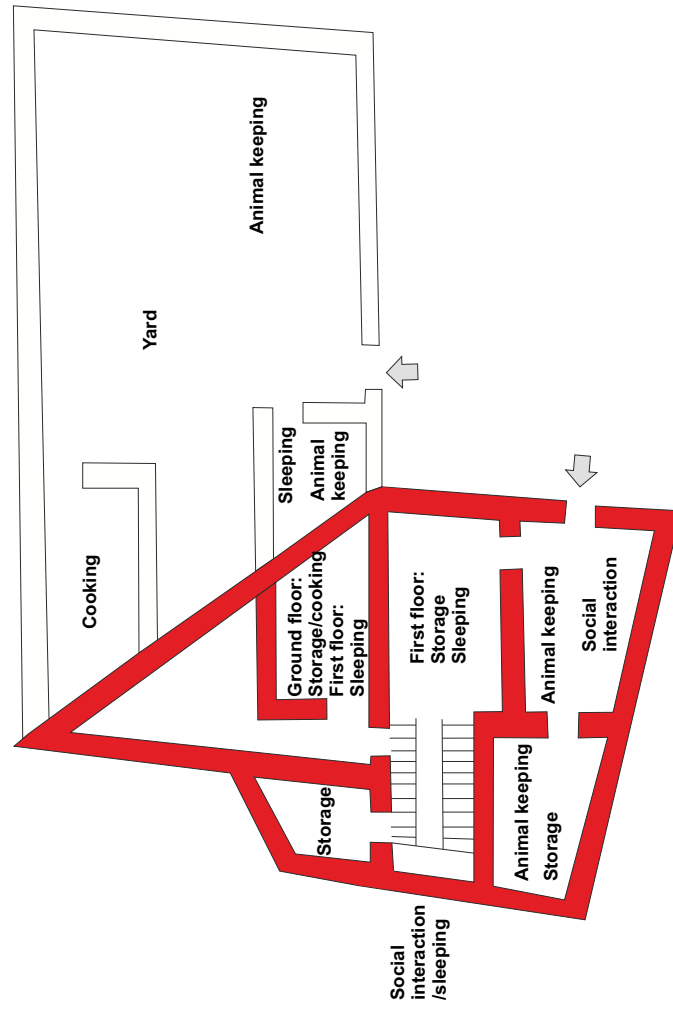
House of Adli Masud: Roof plan and ground floor plan (Henein 1988, 25).
